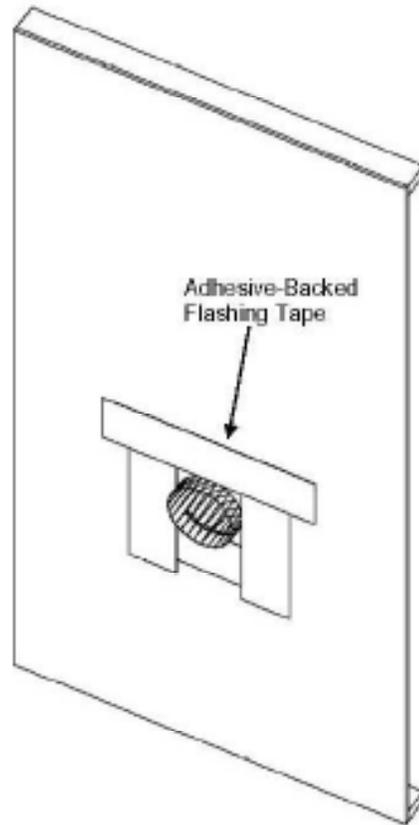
INSTALLATION AT PENETRATION OPENING (NON-FIRE-RESISTANCE RATED)
